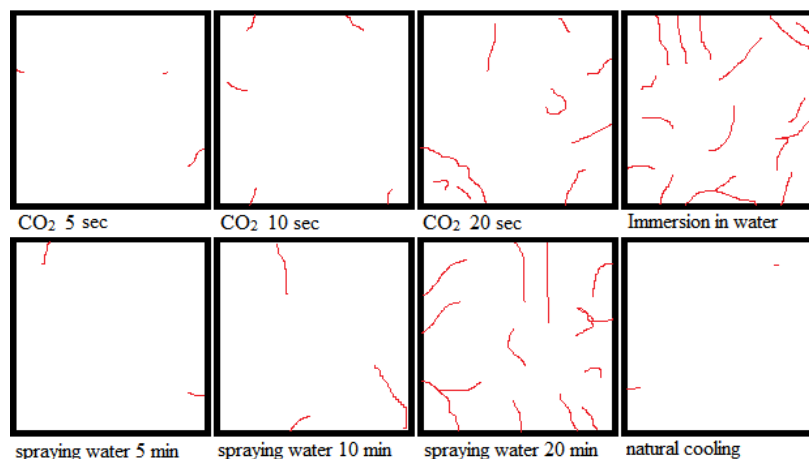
(a). Retouched images of cracks developed at the surface of plain concrete specimens at 400 °C.
